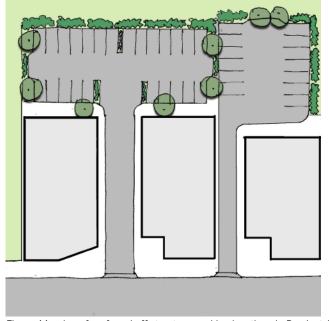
plan of preferred off street car parking locations in Precinct 1
